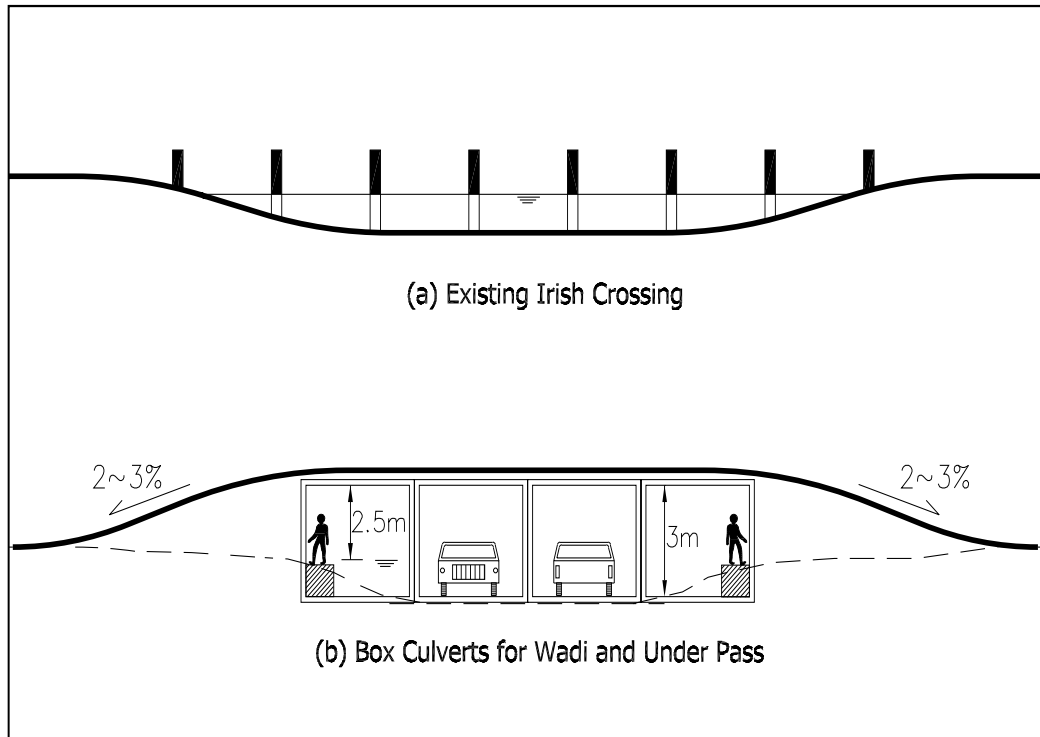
Concept of Multi-Function Box Culvert for Wadi Crossing
